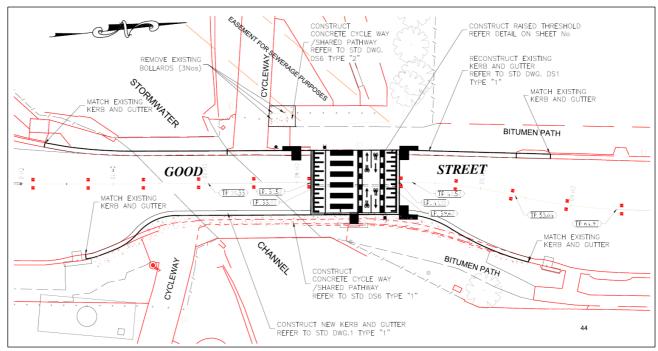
General arrangement plan for the proposed combined raised pedestrian and cyclists crossing in Good Street, Granville
